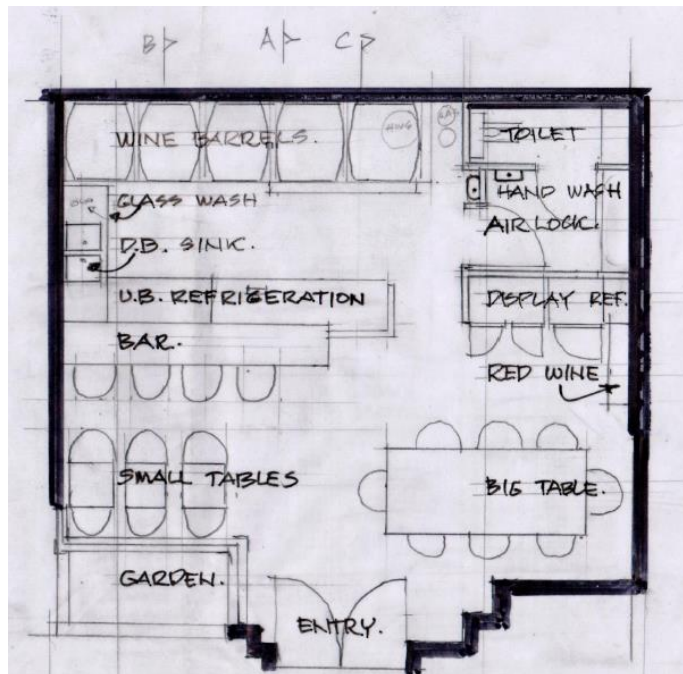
Proposed internal layout of the wine bar (Decision Plans, 2021)
